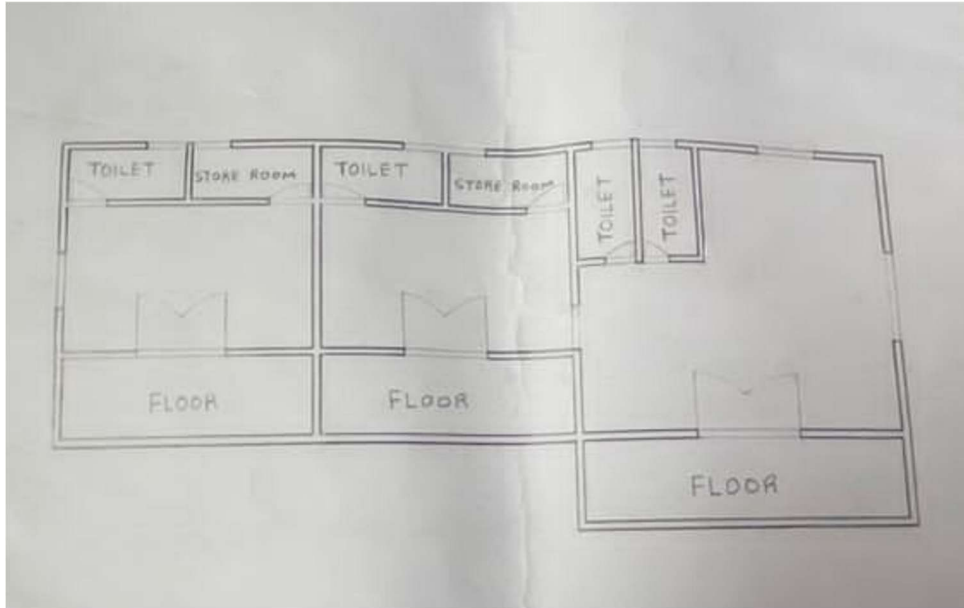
FLOOR PLAN OF CASE STUDY ONE
